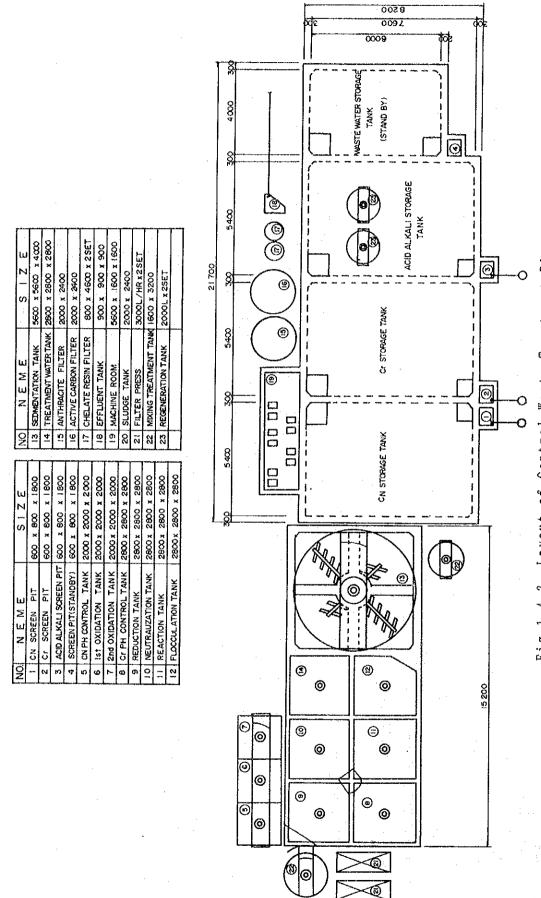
Layout of Central Waste Treatment Plant
